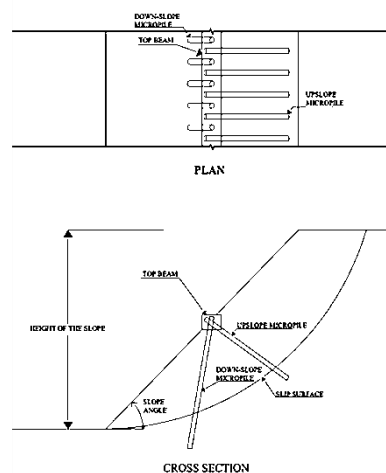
Plan and Cross Section of typical Micropile wall installation for improving slope stability (Anirudhan and Niranjana (2017))
